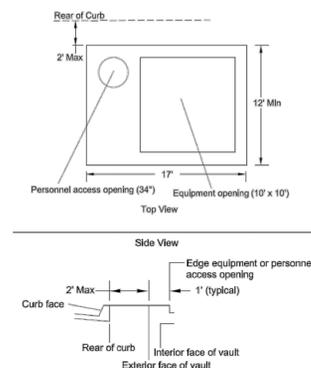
Proximity of Below Grade Vault equipment and personnel access opening to street.
